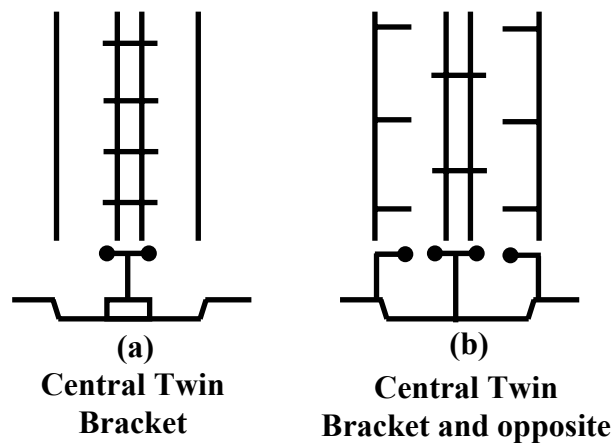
Lighting arrangement on the 2 Lane Roads.
